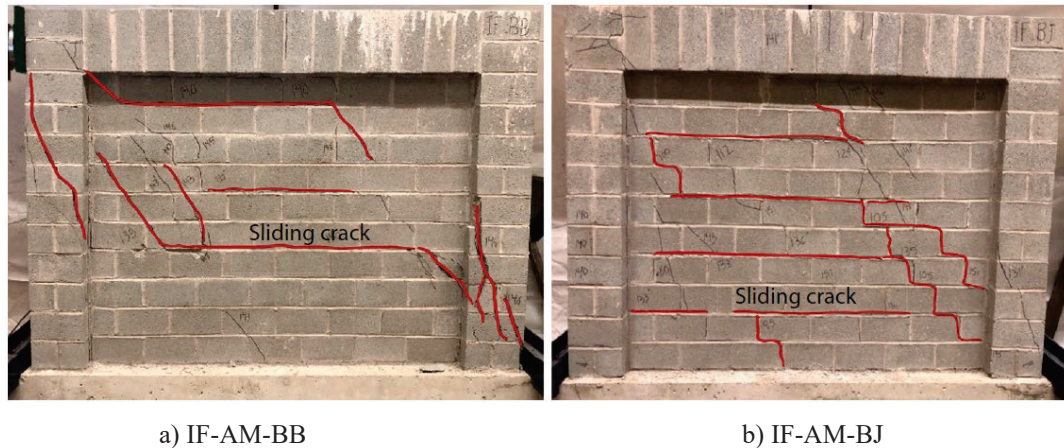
Failure pattern of Group 4 specimens with infill horizontal reinforcement
